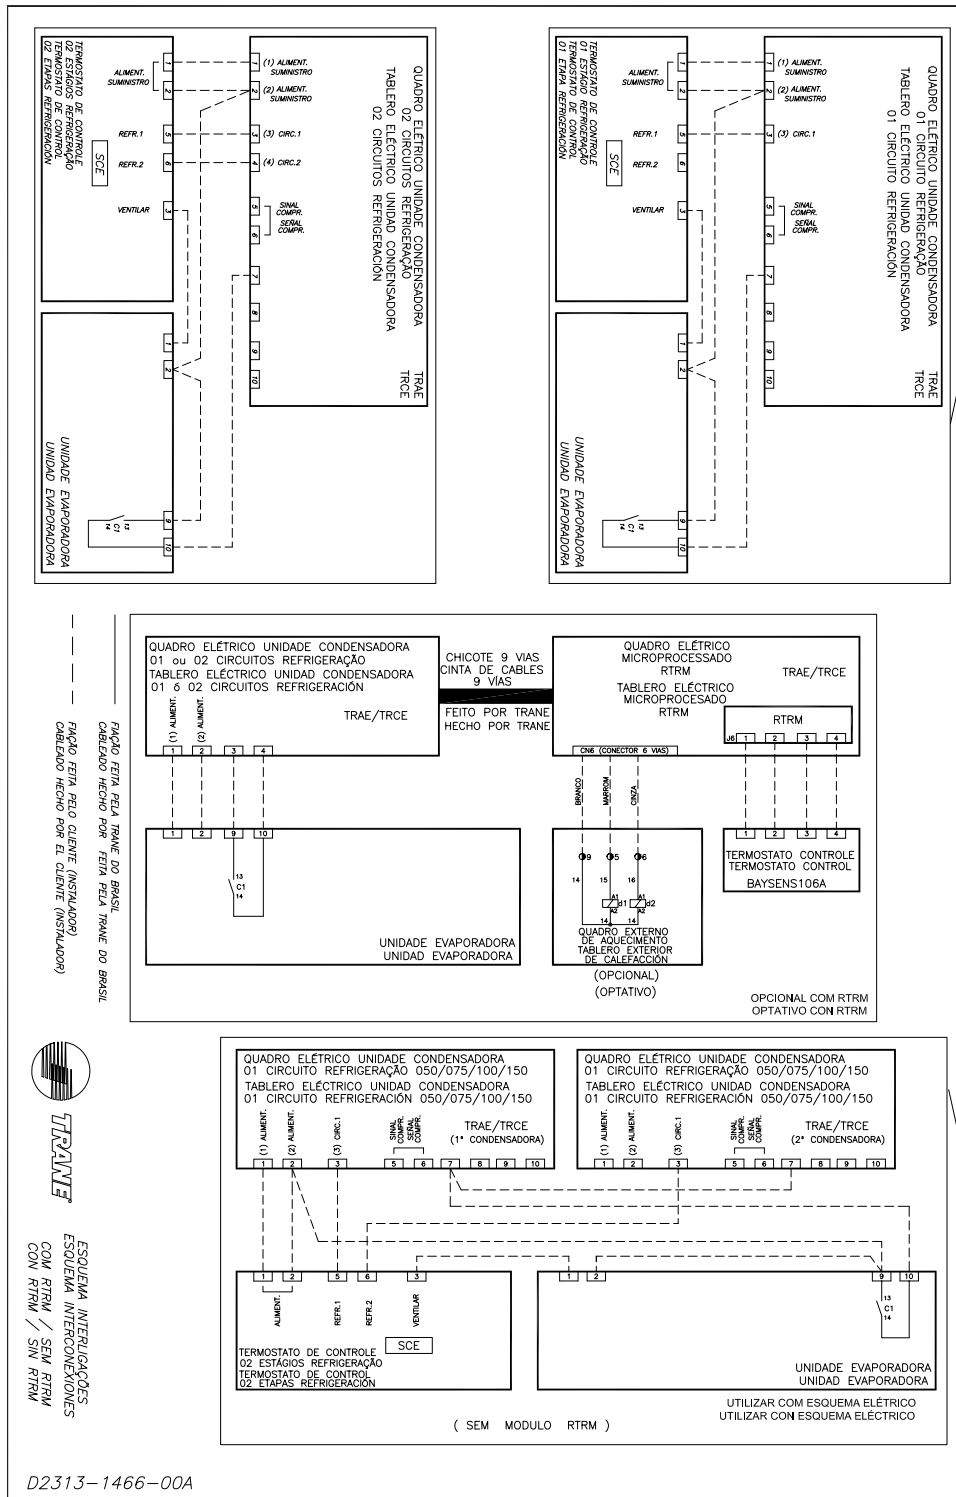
Control Panel Lay Out - TRCE (Standard/RTRM)
